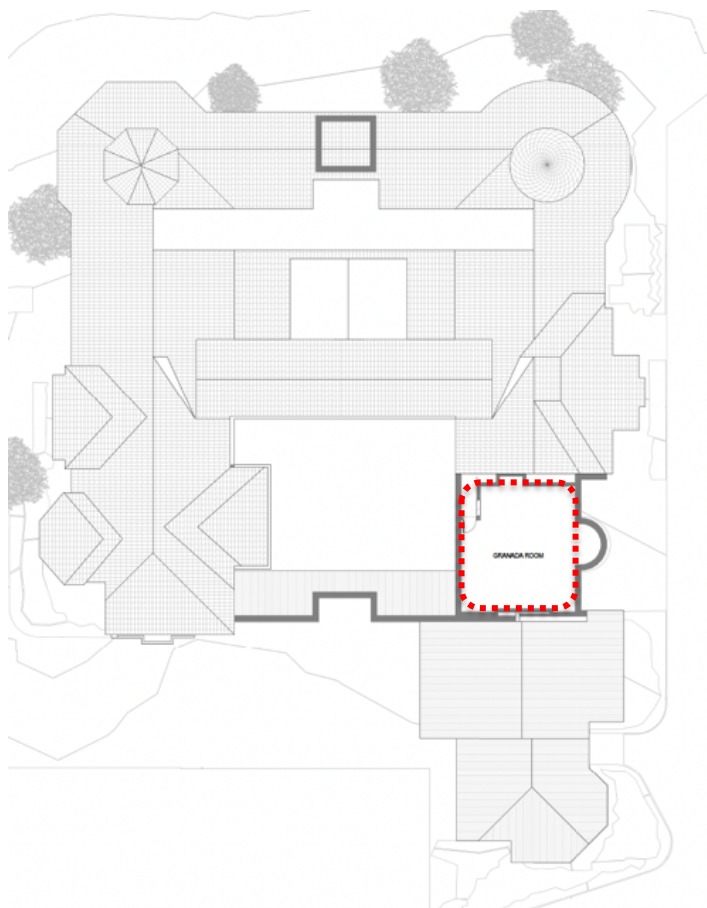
EXISTING FIRST FLOOR PLAN. Grenada Room outlined in red. outlined in red.
